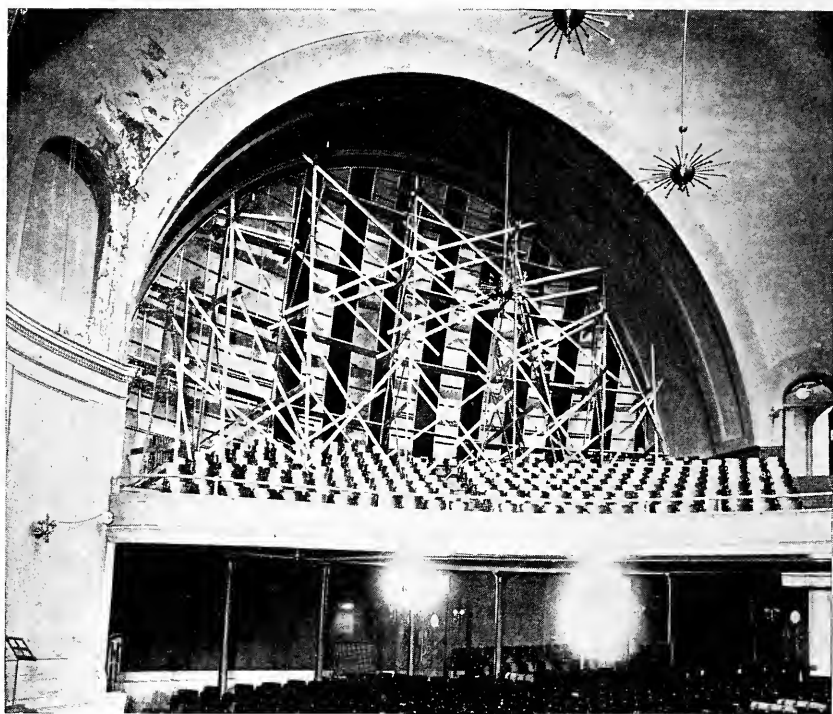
PHOTOGRAPH SHOWING THE MOUNTING OF THE HAIR FELT IN VERTICAL STRIPS. THE MATERIAL WAS FASTENED TO THIN FURRING STRIPS WHICH COULD BE BENT TO CONFORM TO THE CURVATURE OF THE SURFACE
